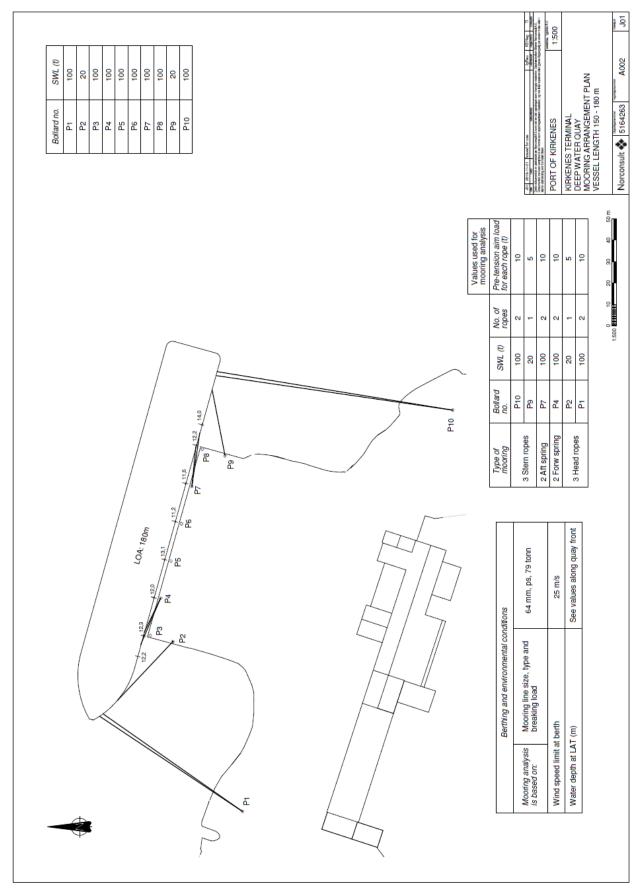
Mooring plan Deep Water Quay, LOA 150 - 180m
